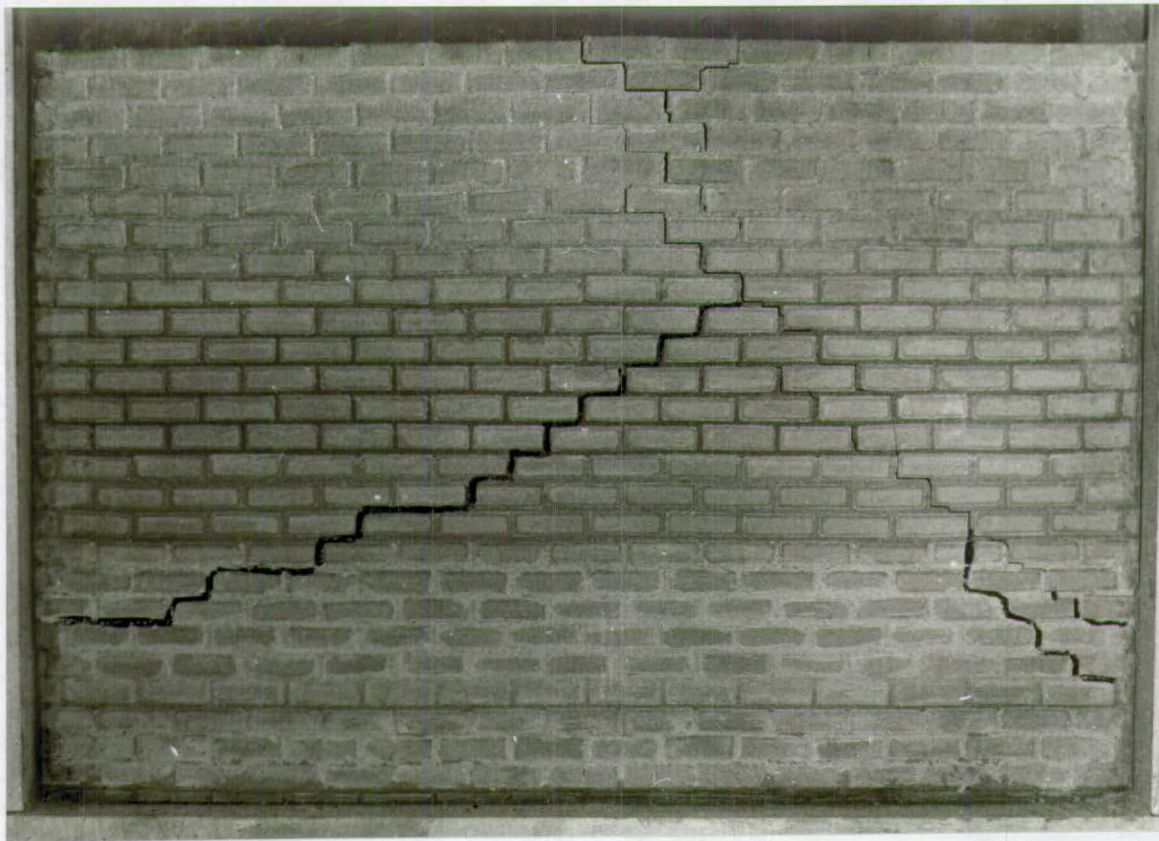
FAILURE OF WALL C2 - 3 SIDES SUPPORTED
